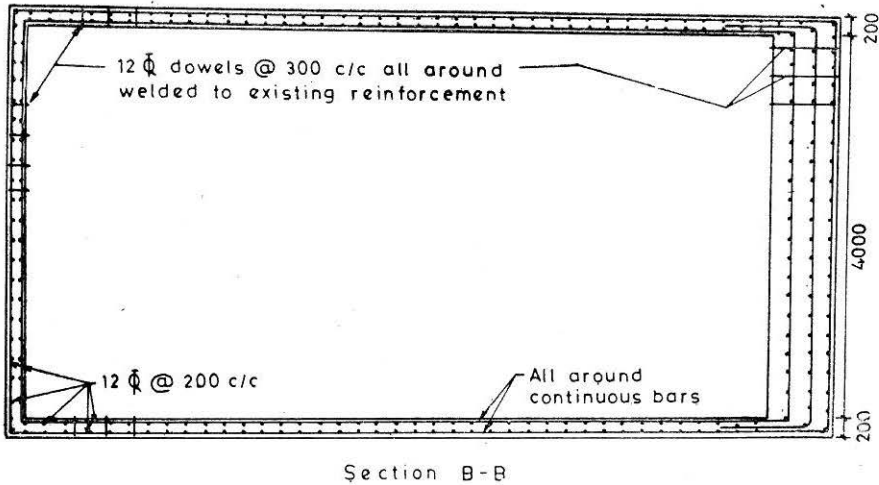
(b) Additional Concrete and Reinforcement to Strengthen Existing Foundation
